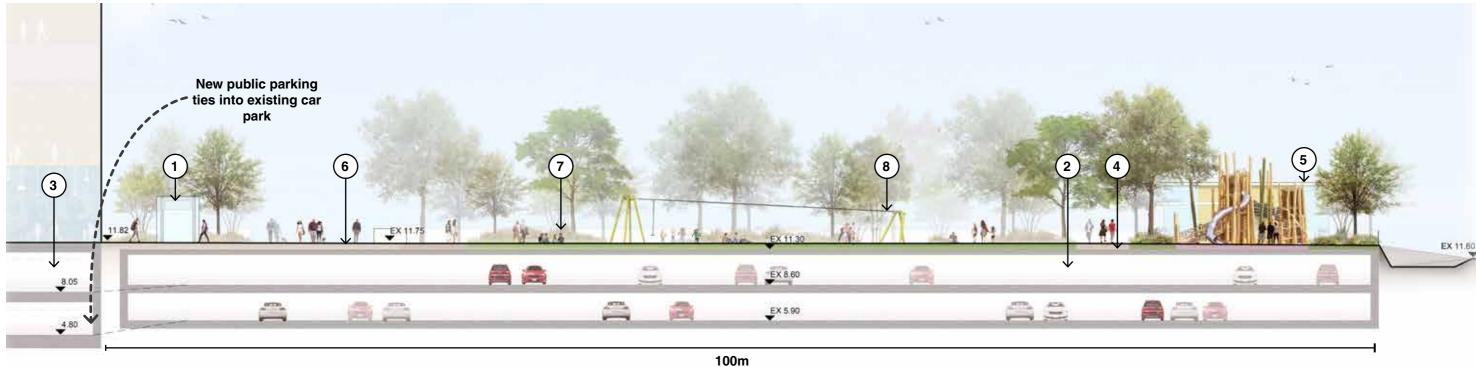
Section D-D looking south towards La Route du la Port Elizabeth
